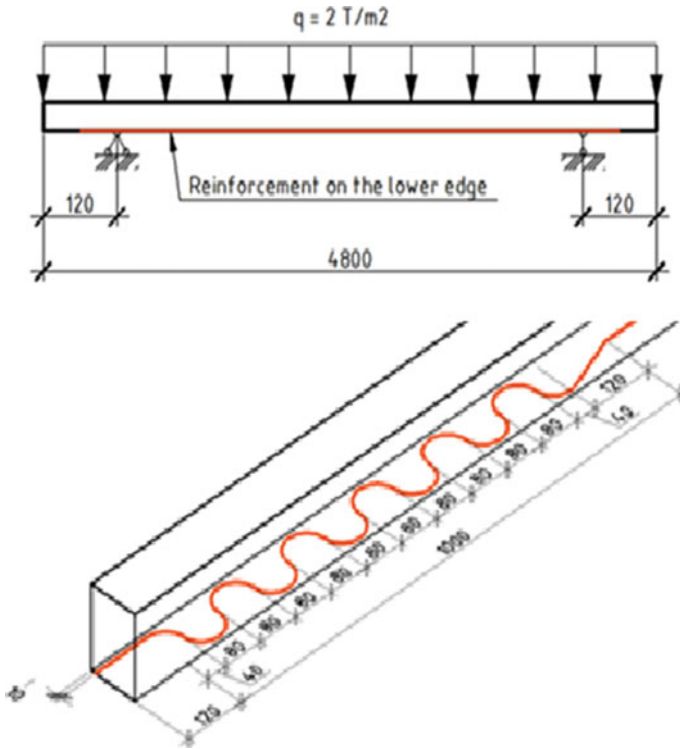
Design diagram of beams with the archy S-shaped reinforcement
